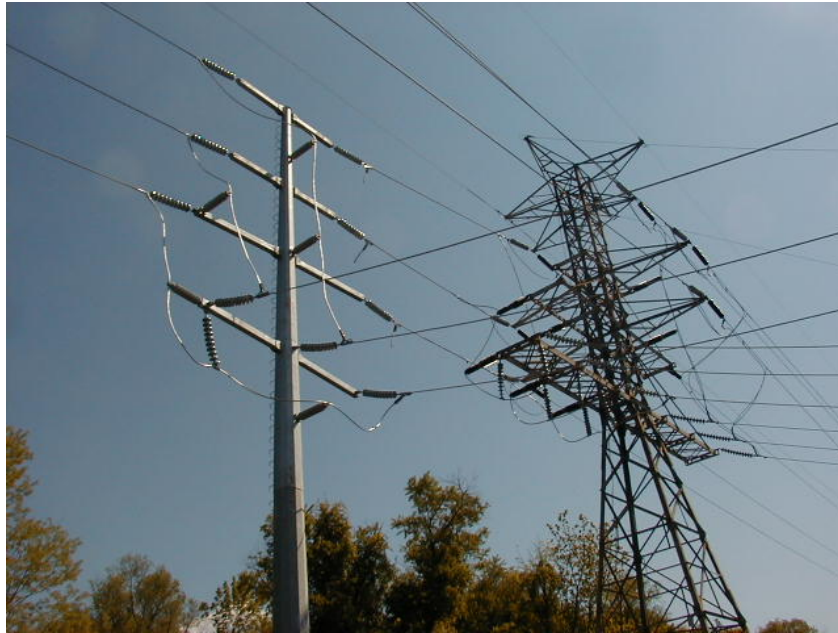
Structures 833B (left) and 833A (right) on north side of substation.
